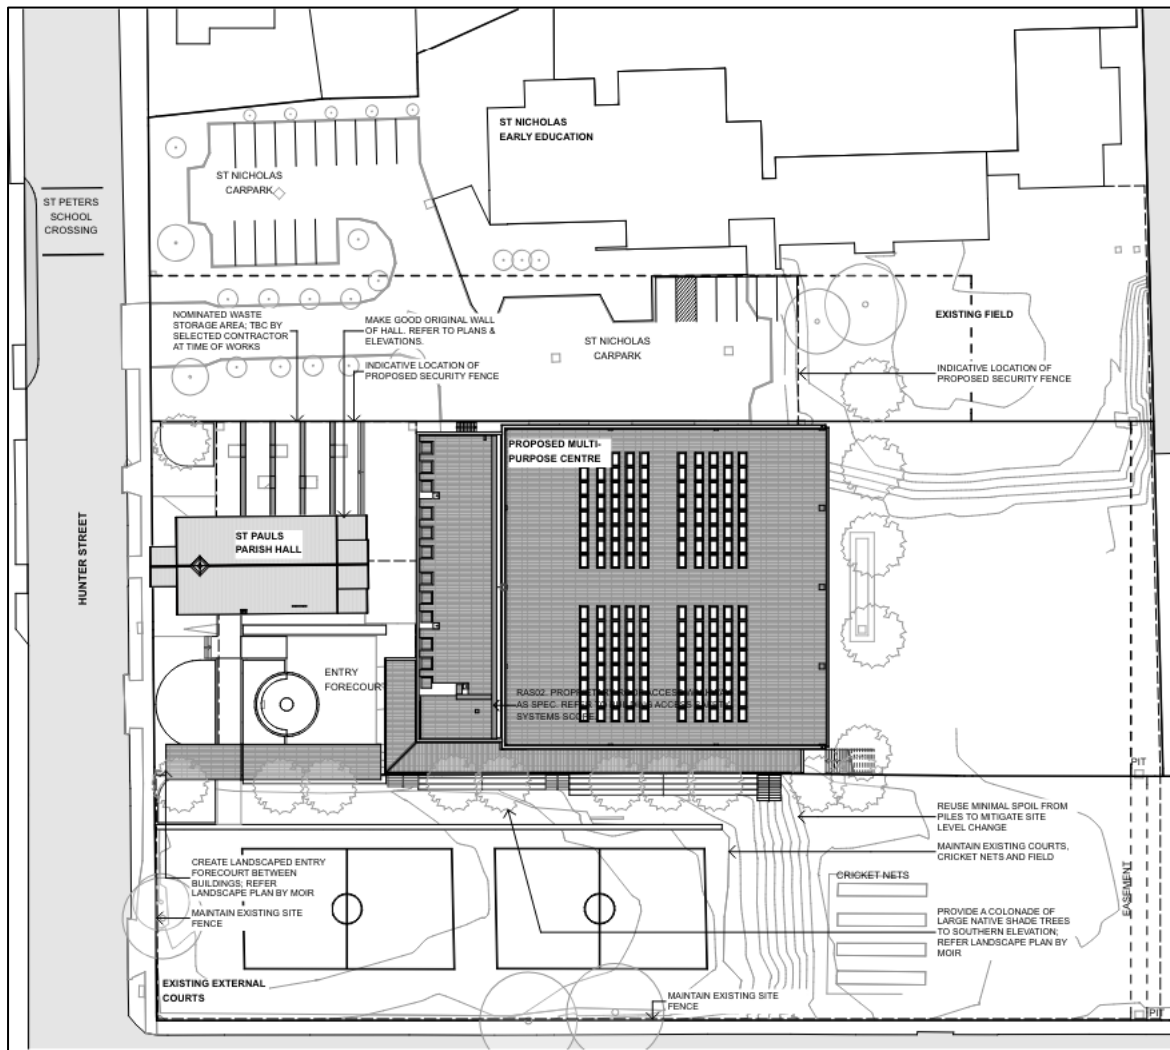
Proposed Site Plan. Source: SHAC Architects, 08/04/24
